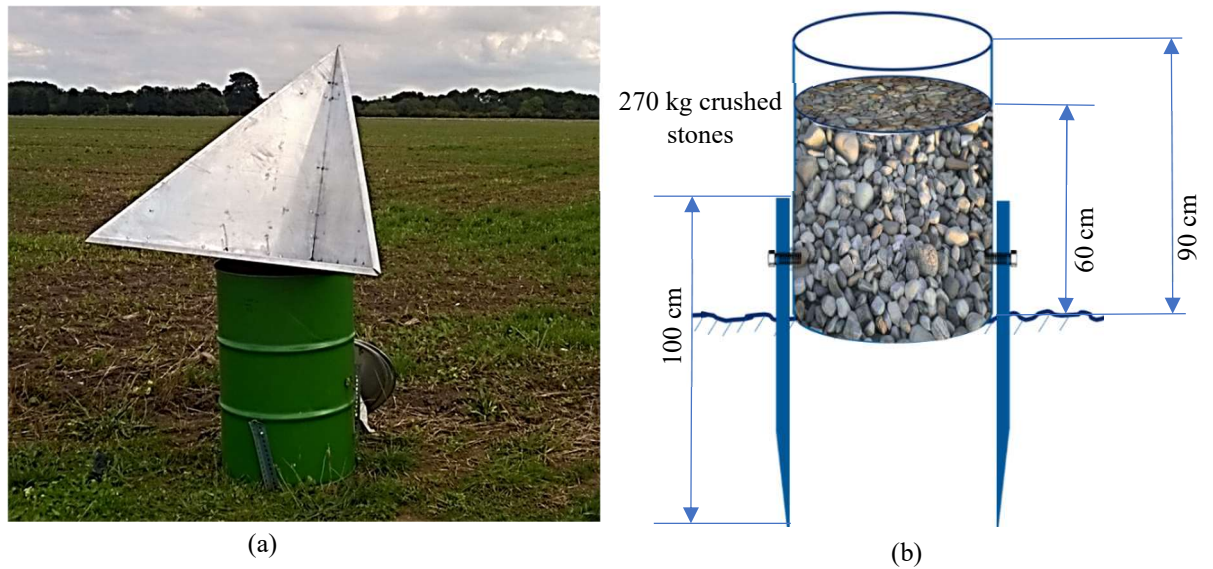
(a) The trihedral CR installed over the steel barrel, (b) schematic of the steel barrel foundation.
